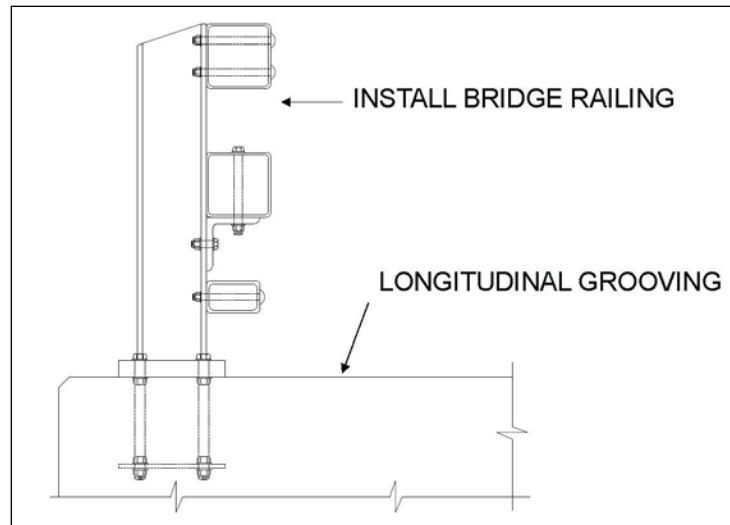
Construction detail of innovative bare deck design with flush-mounted rail.
